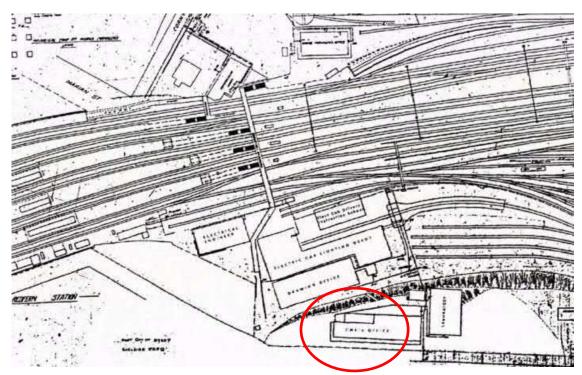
Undated early layout of the Eveleigh Railway yard showing CME building, connection to the Workmen's footbridge and other structures (the drawings Office, the Electrical Car Lighting Depot, the Testing Laboratory and the rails (Rappoport, 1997)
